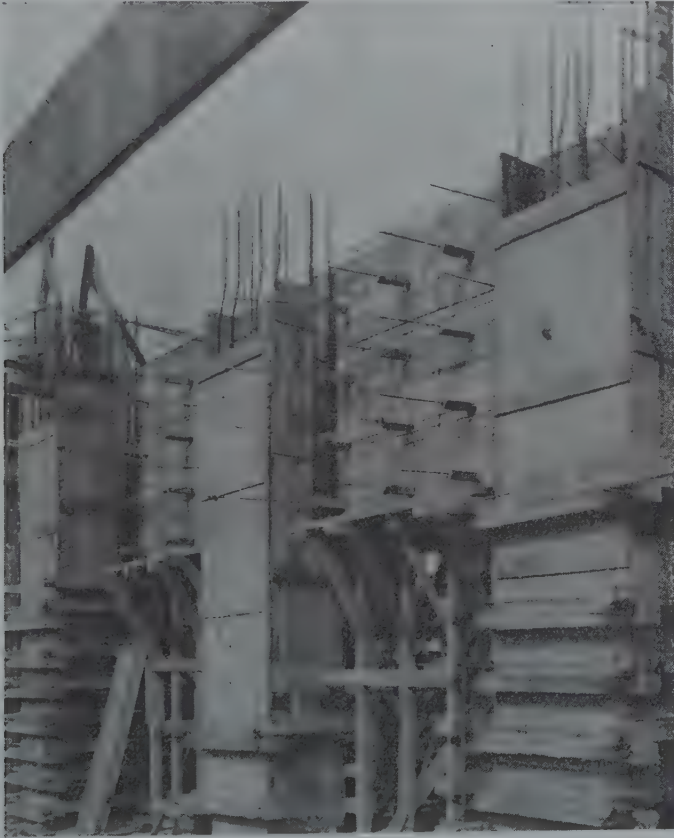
FIG. II. WAREHOUSE COLUMN FORMS IN PLACE.
